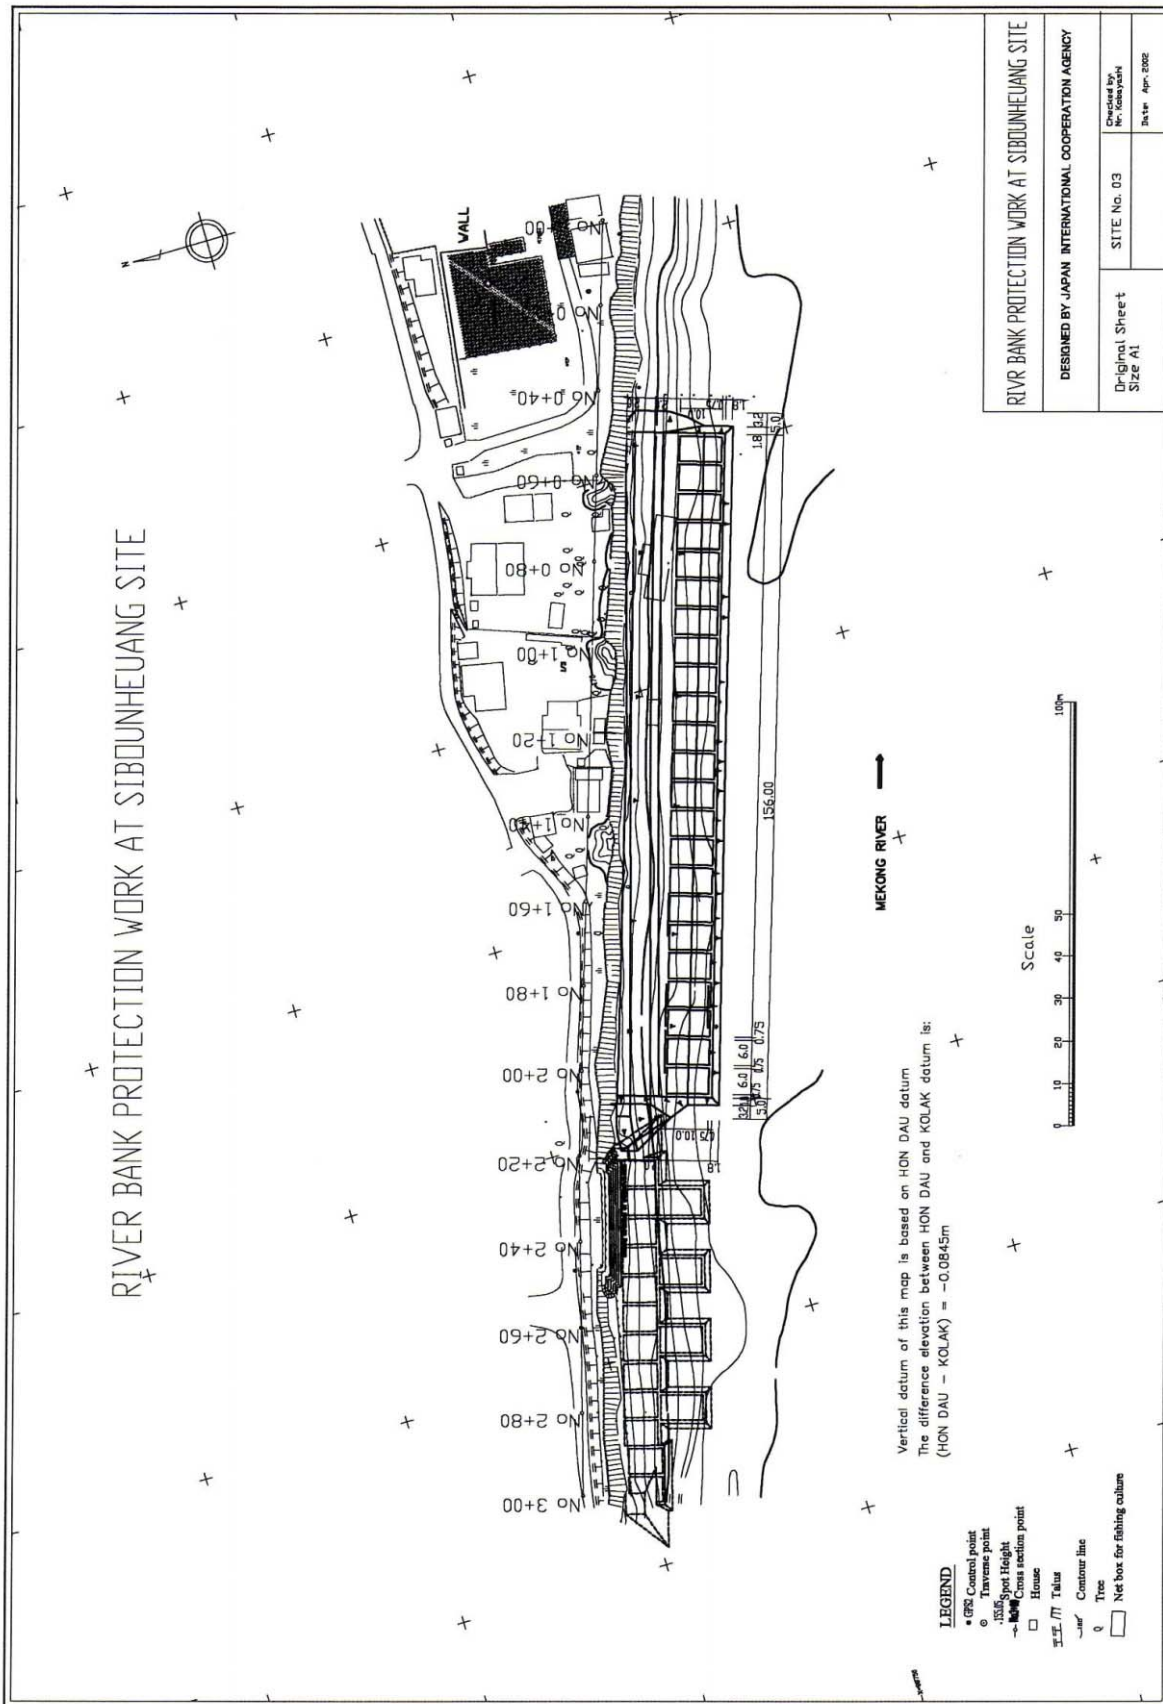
Location of Topographic Survey Lines at Sibounheuang Site
